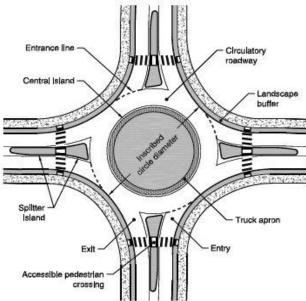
a layout of a typical roundabout, (ODT, 2000)
